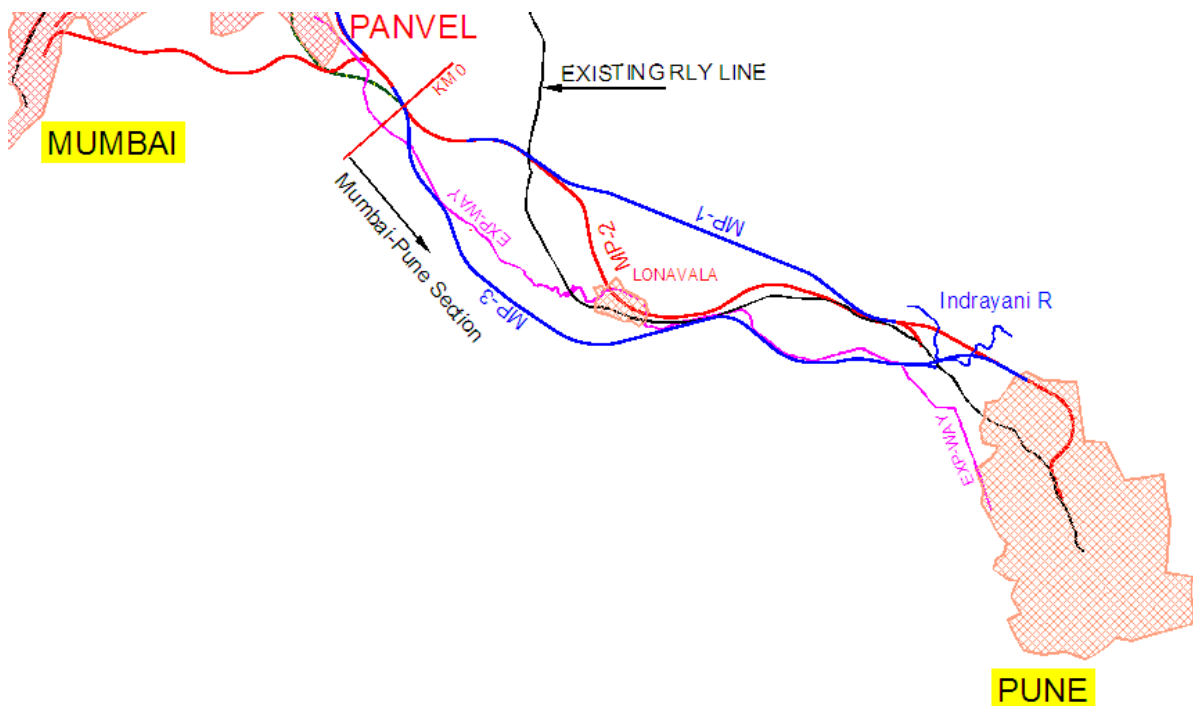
Alignment Plan of the High Speed Railway for Mumbai - Pune
